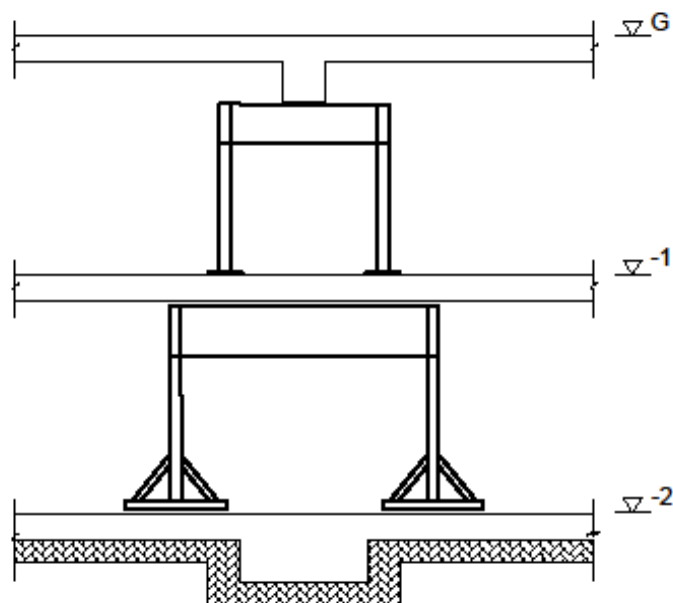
d. Temporary propping and installation of thickened lower basement slab.
